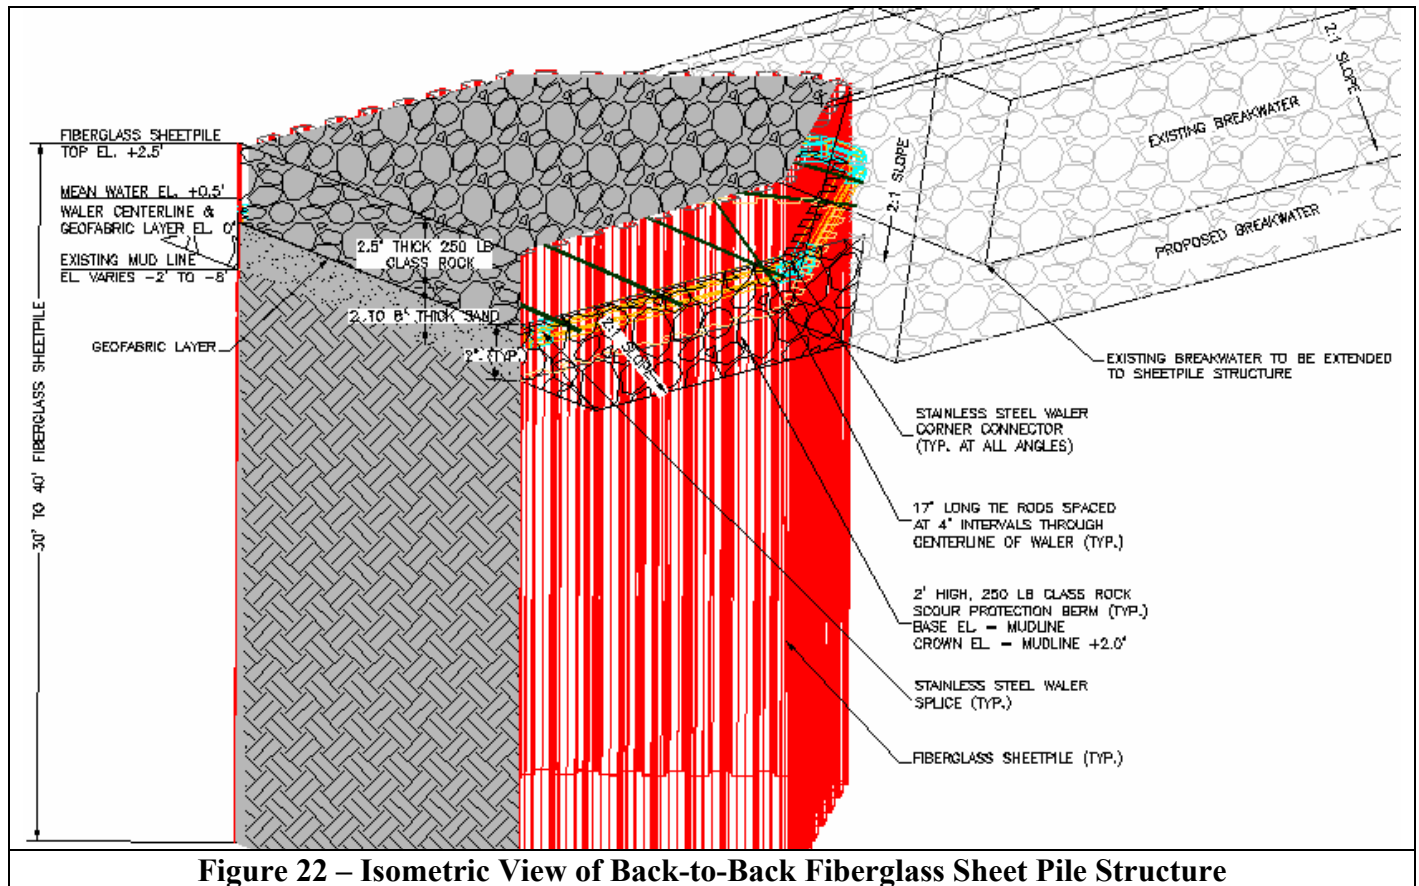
Isometric View of Back-to-Back Fiberglass Sheet Pile Structure
